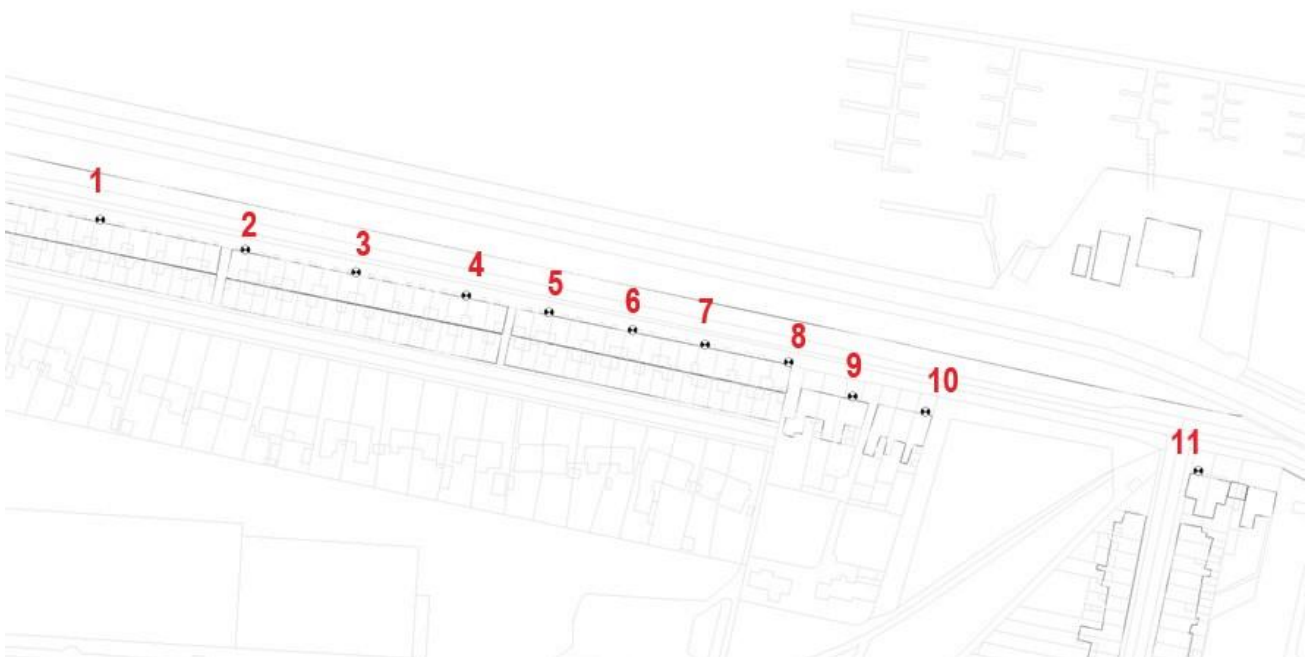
Location Specific Properties Along Pigeon House Road to Illustrate Worst-Case Construction Noise Levels in
